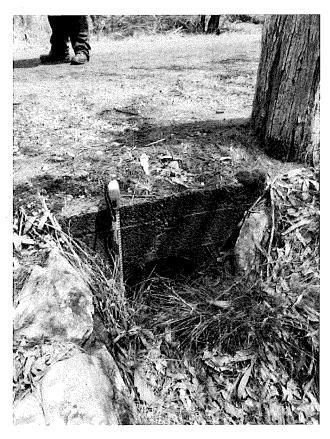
1940s era concrete culvert with stone lined drain, north of main building.
